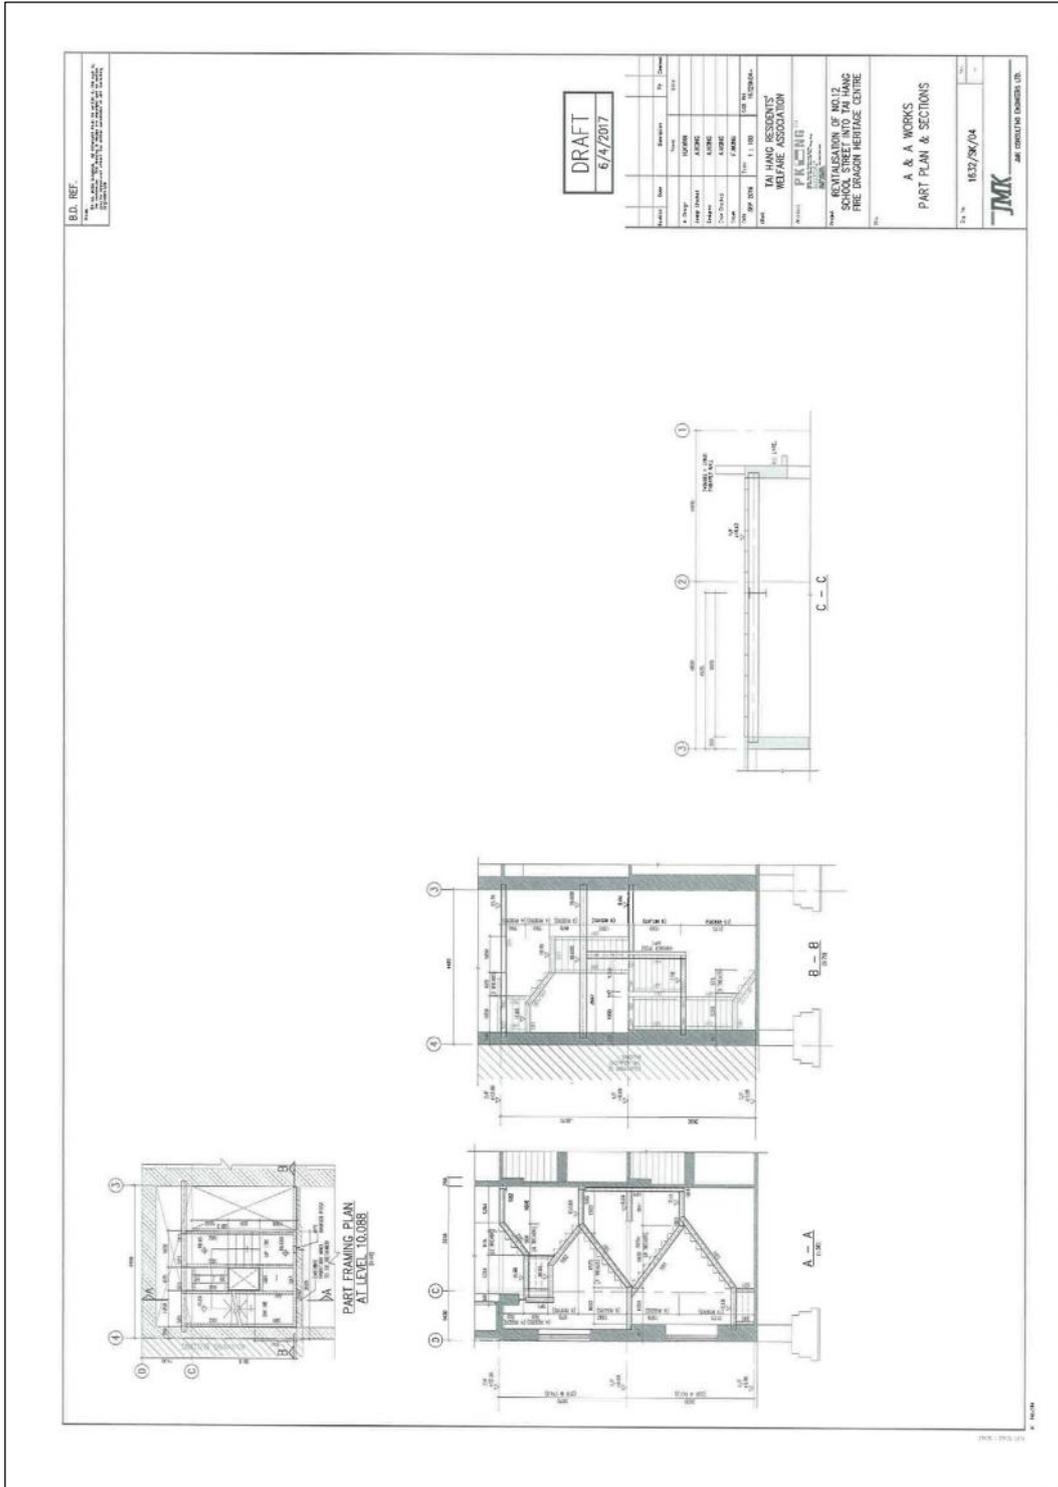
Ground floor and first floor structural alteration and addition works
